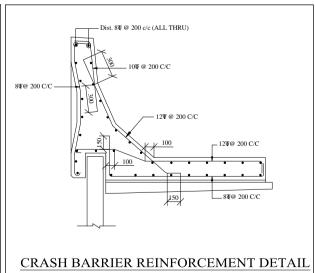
\$ 83: TYPICAL CRASH BARRIER AND FRICTION SLAB DIMENSIONS AND REINFORCEMENT DETAILS
